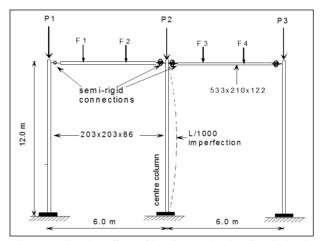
Frame used to examine the effect of loading and unloading behaviour of the connection
